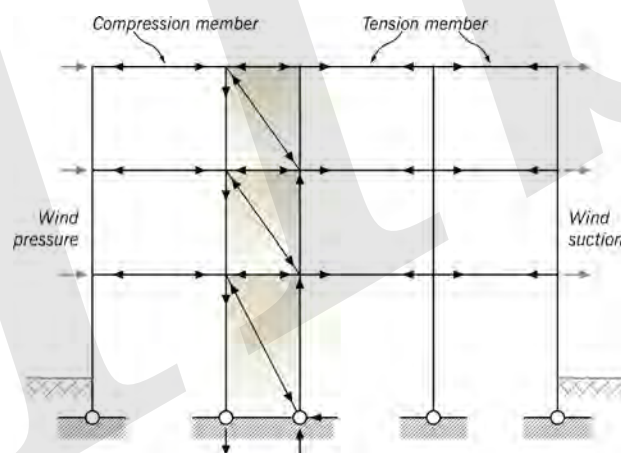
Transfer of horizontal forces to wall bracing.
